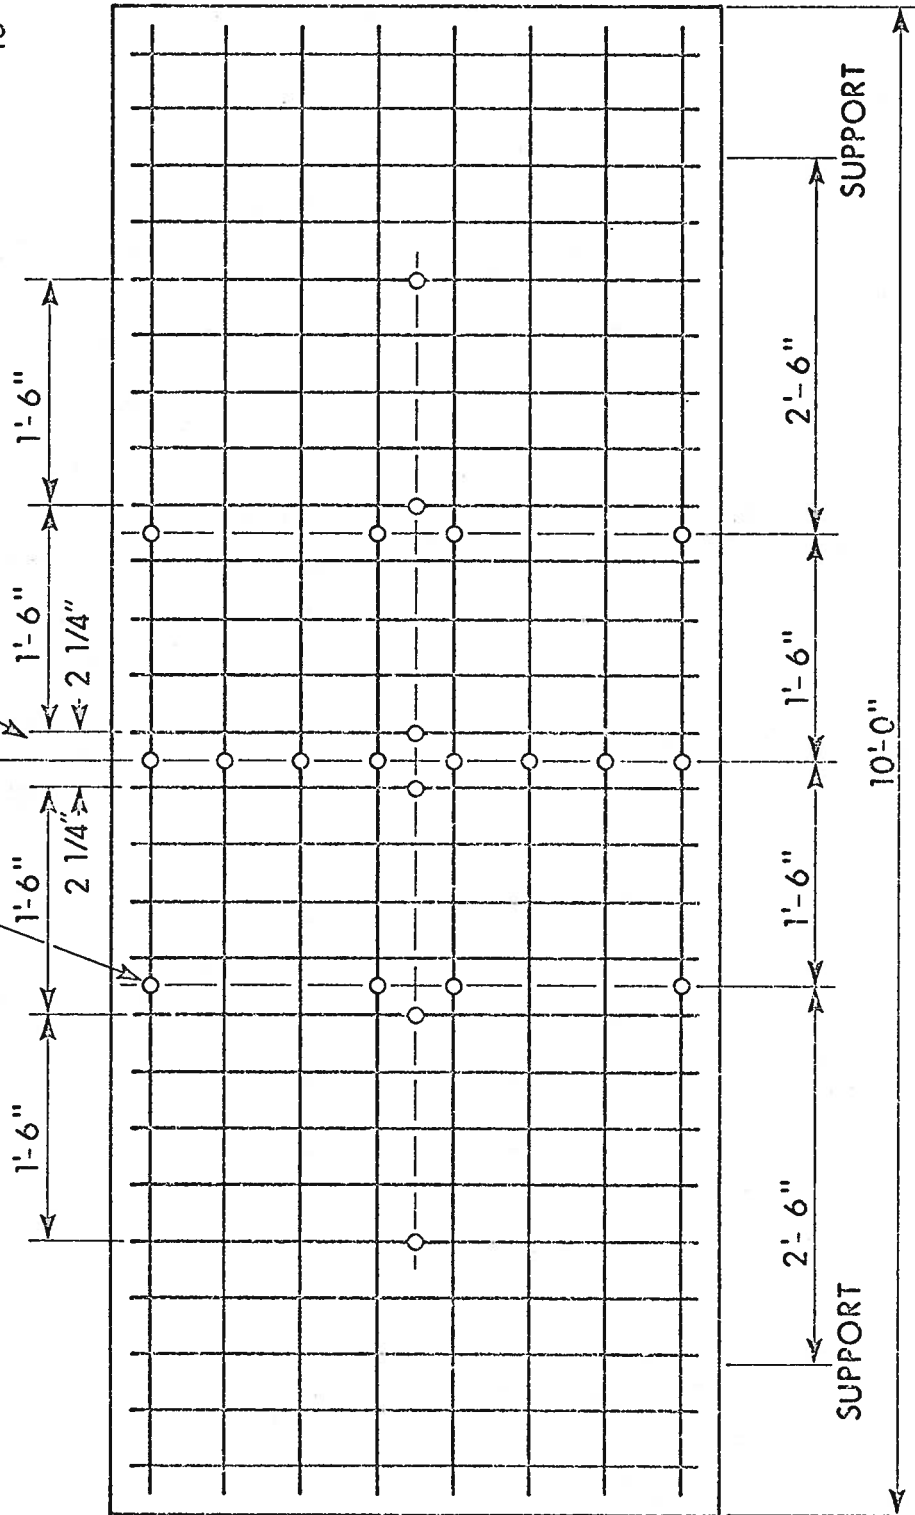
TYPICAL LOCATION OF STRAIN GAGES ON SLAB REINFORCEMENT 21
